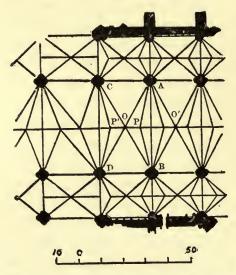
Lincoln, England: Cathedral. Plan of choir vaulting. About 1225 A.D.
